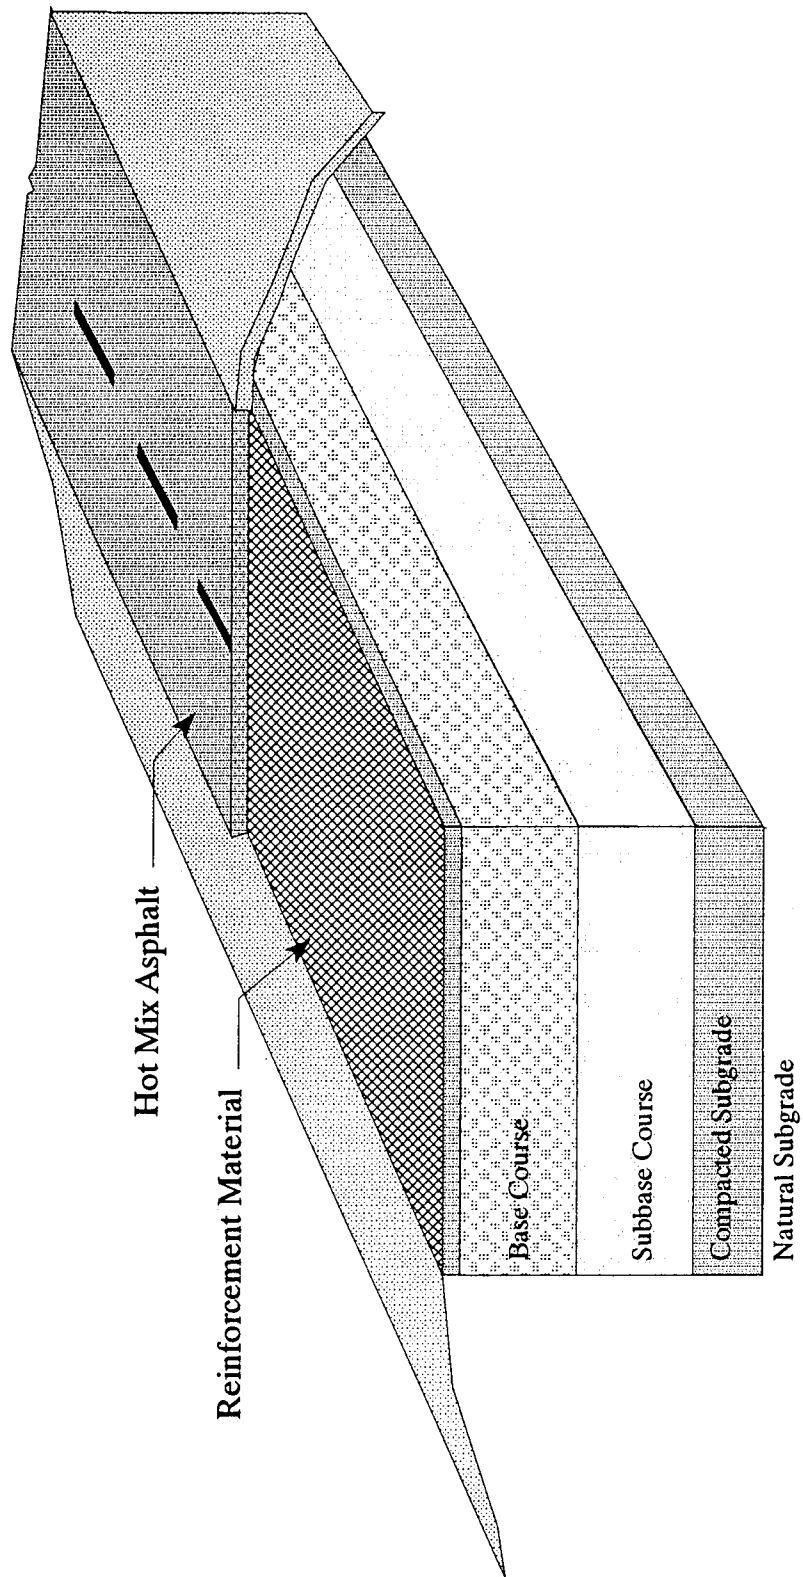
A Schematic Figure of a Reinforced Pavement Section
